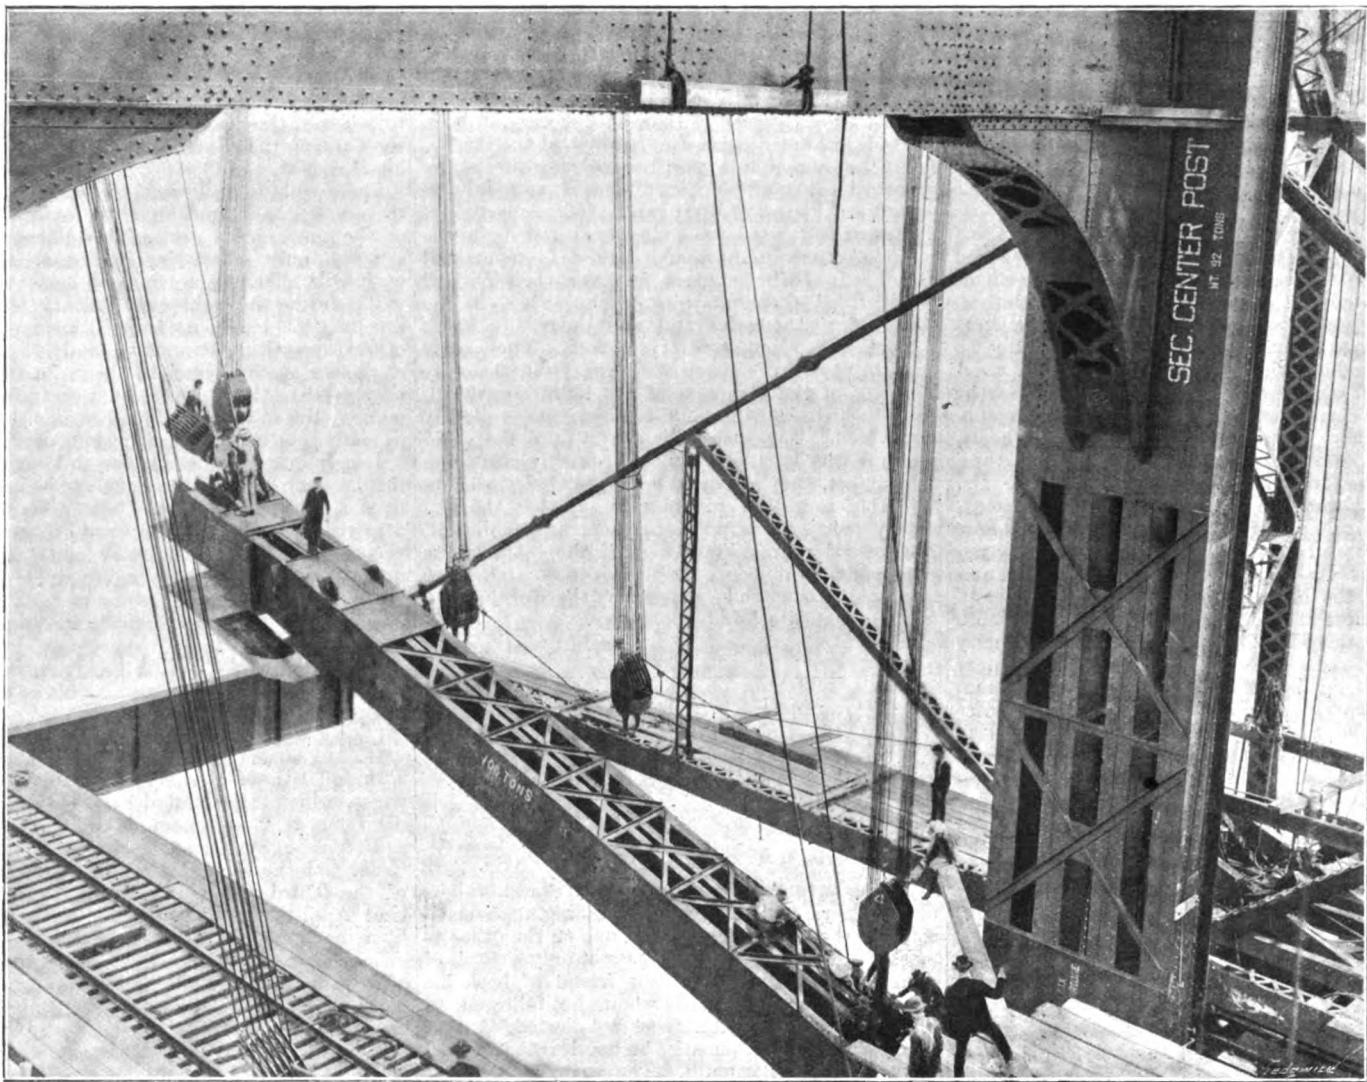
FIRST LOWER CHORD PANEL OF SOUTH ANCHOR ARM.
